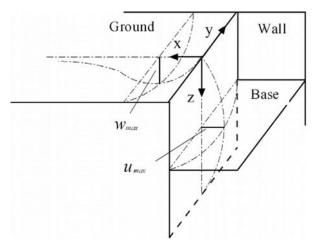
Braced excavation induced wall deformation and concave ground settlement profile [19]
